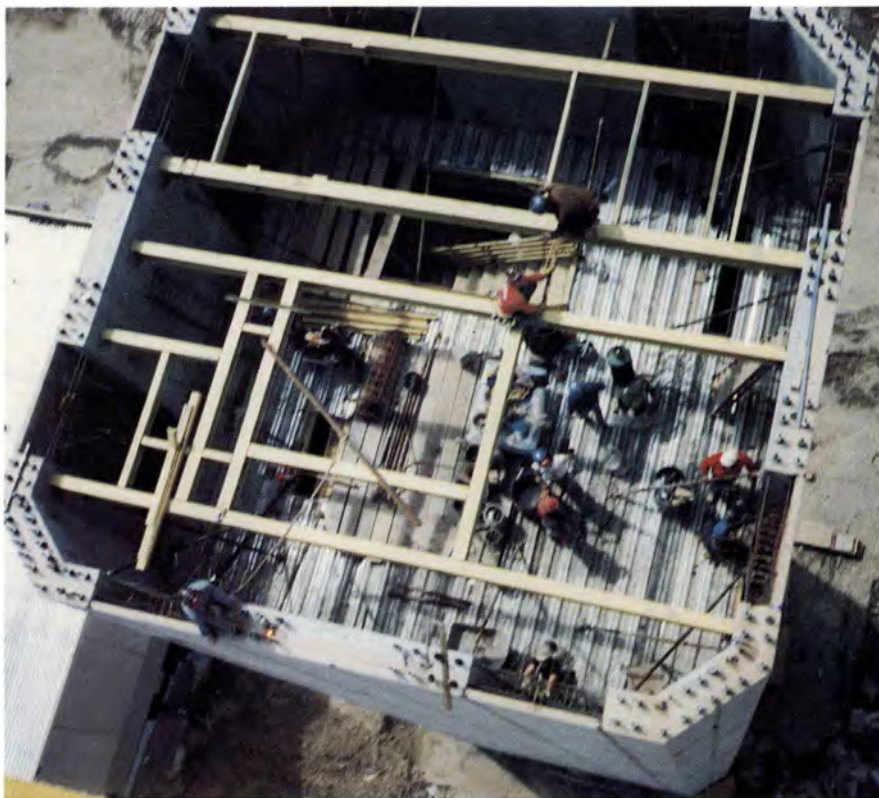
Overhead view of tower shaft showing structural precast panels alternating with thin veneer precast panels. Note that veneer panels act as a stay-in-place form for cast-in-place concrete.
